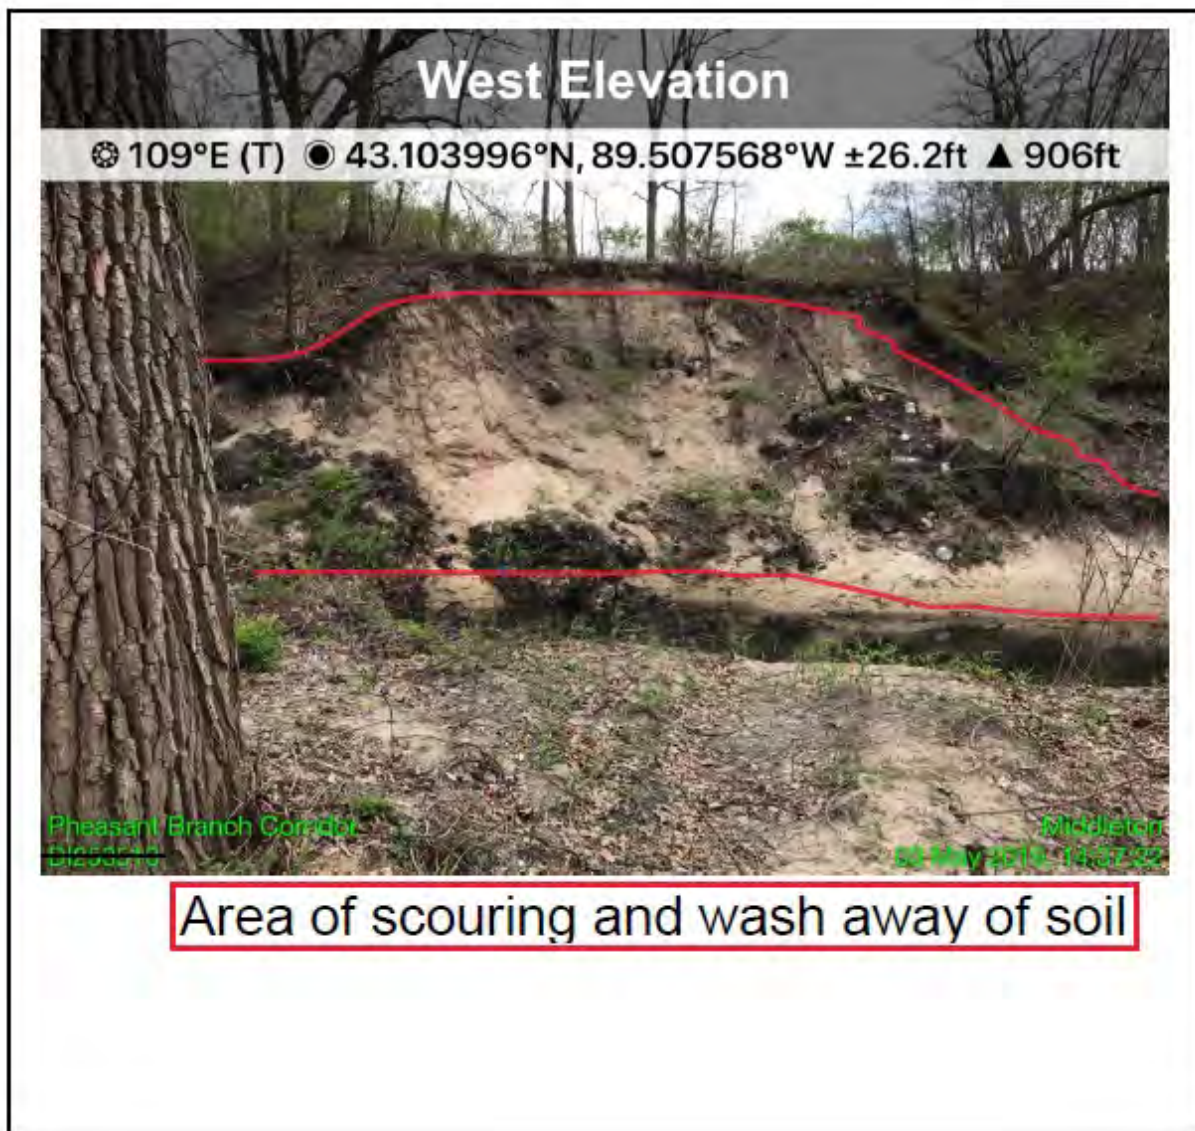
Site 9 (May 2019) taken at 43.103996, -89.507568. View of eroded south streambank facing east.
